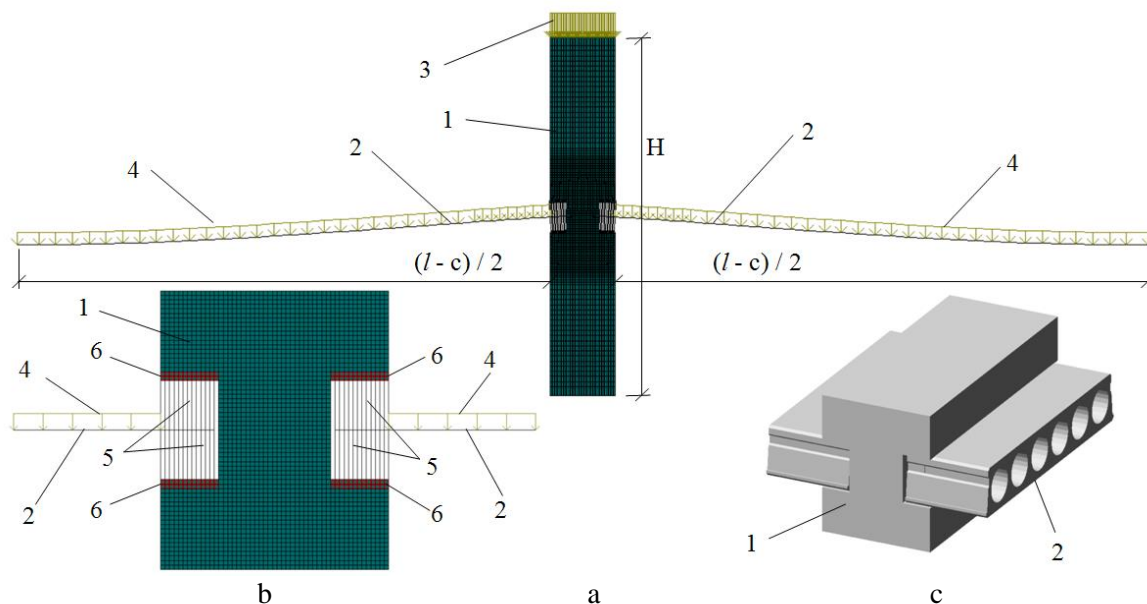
Axisymmetric finite-element models of the system "slab - masonry" (a), fragment of the finite-element model at the level of slab closing in the masonry (b) and 3D image of the support unit (c). H – floor height; l - slab length; c - depth of embedment of the supporting zones in the wall; 1 – masonry; 2 – slab; 3 – load providing the required compression of masonry; 4 - standard load on the slab; 5 – rods of high rigidity; 6 - mortar joints.
